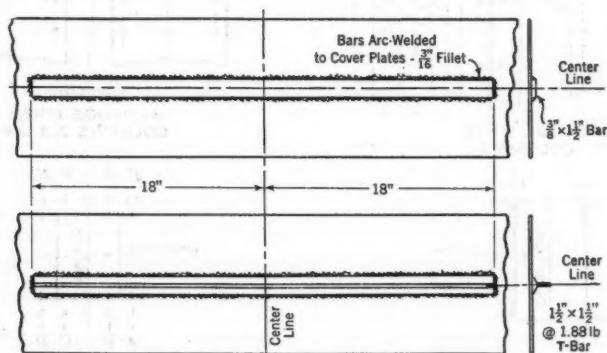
BARS WELDED TO COVER-PLATES, COLUMN NO. 4.
